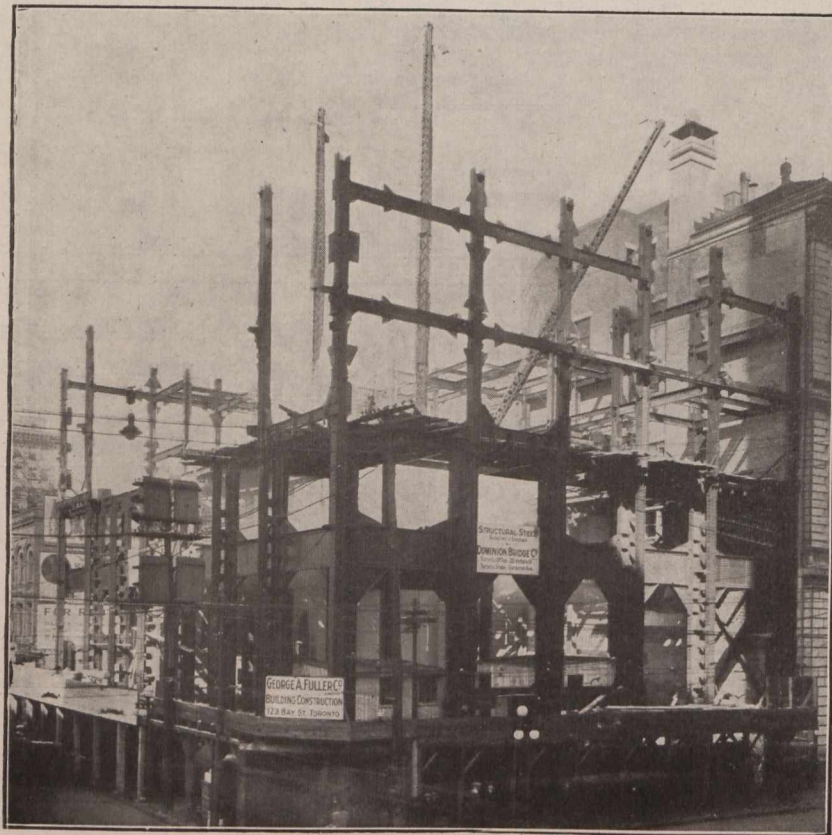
State of Erection of Royal Bank Building on March 20th, 1914.
